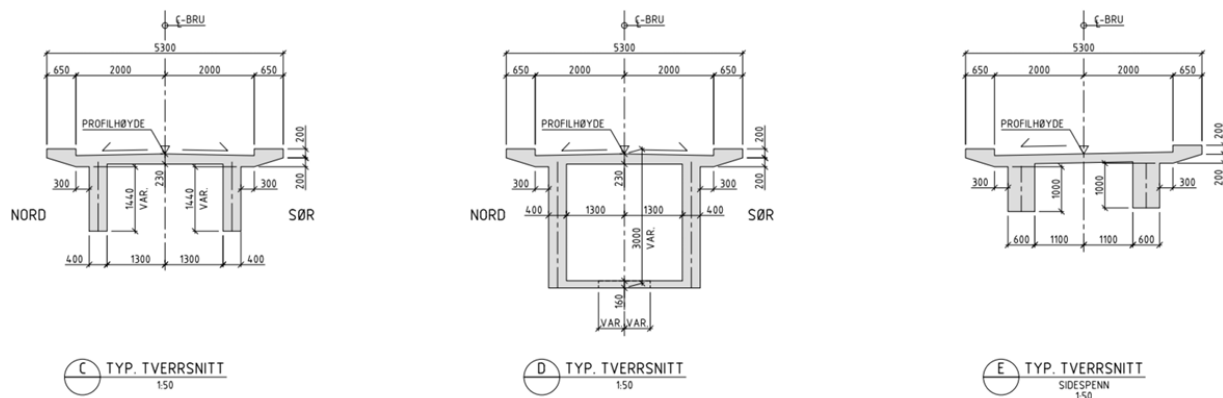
Top deck cross section profiles of bridge spans 1-7 all dimensions in mm [8].
